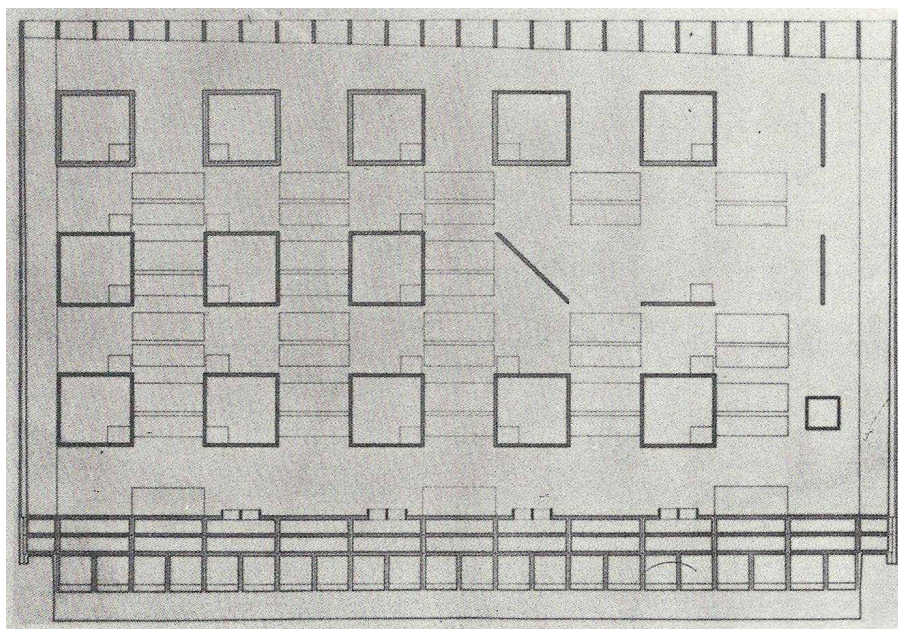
Franco Purini, 'Progetto di un edificio lamellare' (1968). Longitudinal section.
